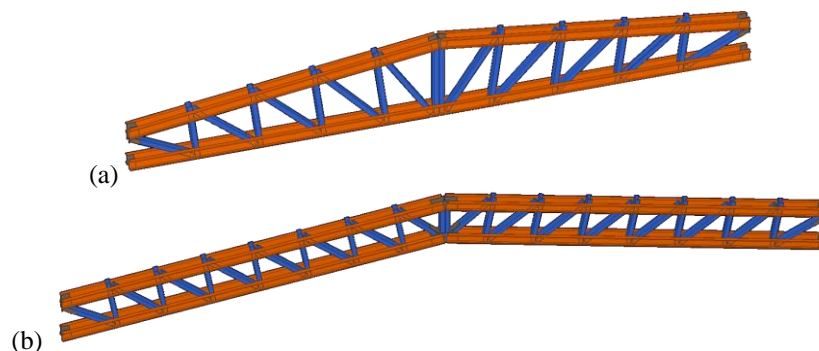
(a) 12 m span trapezoidal truss; (b) 16 m span parallel flanges truss
